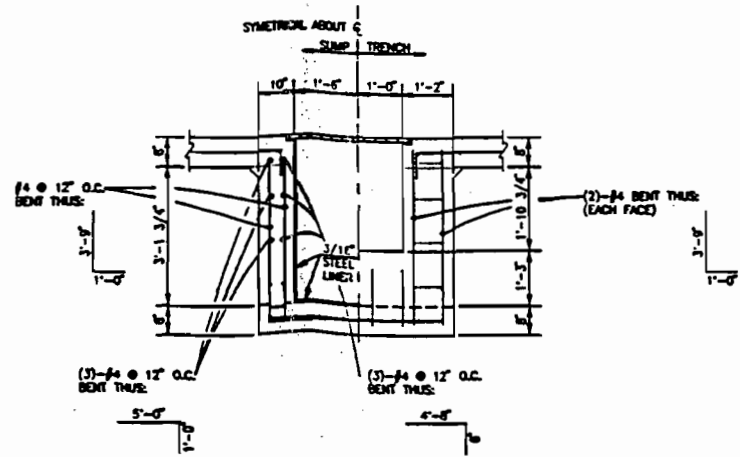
" AND BEAM "B" DETAIL N.T.S.
